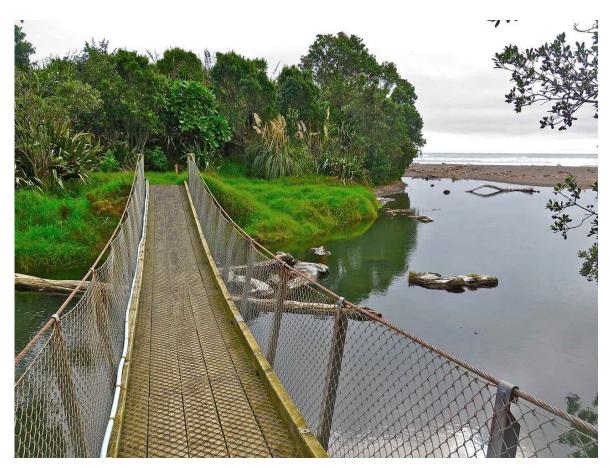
Photograph looking west from Ahu Ahu road across the previous swing bridge (now destroyed) towards site of proposed shared pathway.
